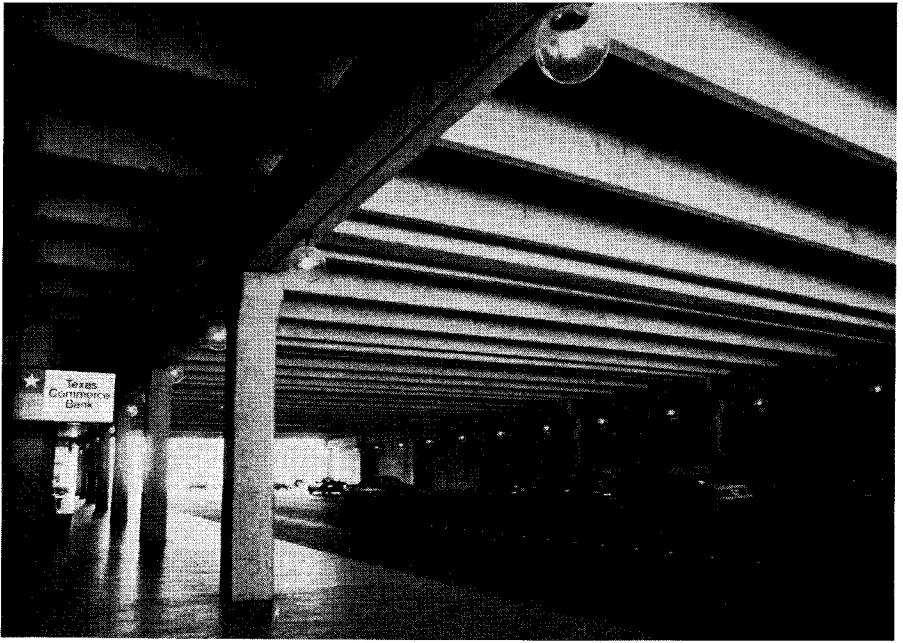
View of structure bridging Throckmorton Street — a six-lane city street. Precast single tees span 80 ft (24.4 m) between supports and cantilever 10 ft (3.05 m) beyond.
